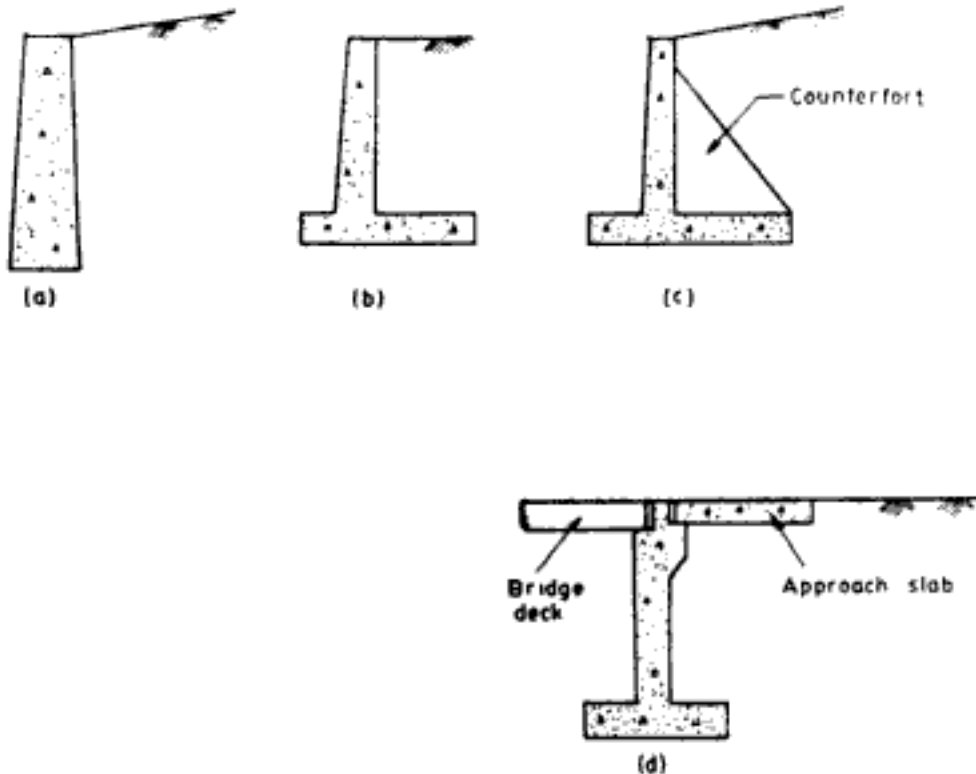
Rigid retaining structures: (a) gravity retaining wall, (b) cantilever retaining wall, (c) counterfort retaining wall, and (d) abutment
